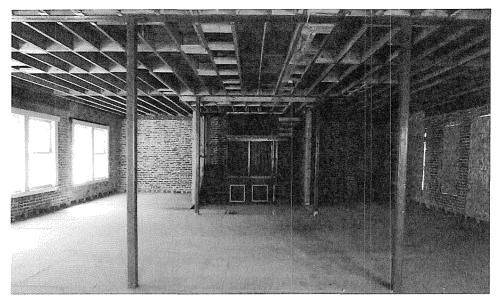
Photograph of typical south interior elevation. (photograph taken on 02/27/2018).
